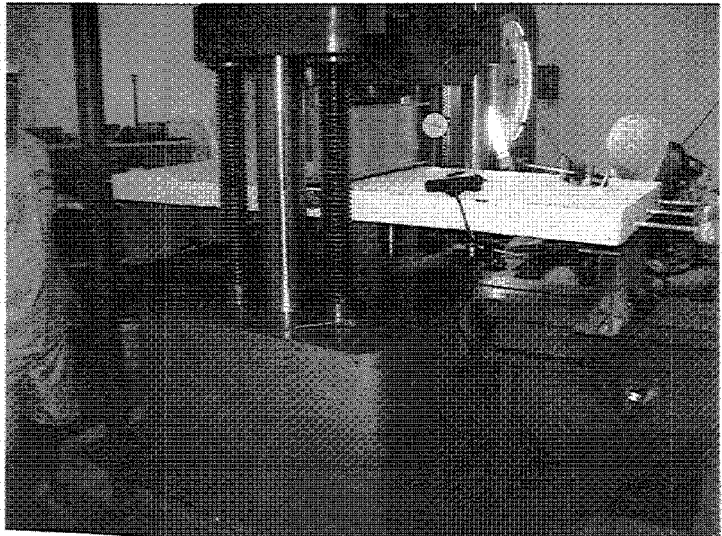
Isometric view of overall test setup (Test 1 precast slab shown)
